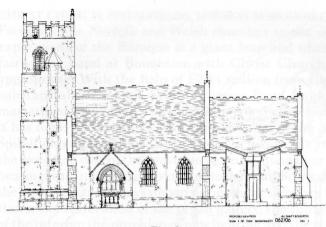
Proposed south elevation Drawing, Jeremy Stacey
